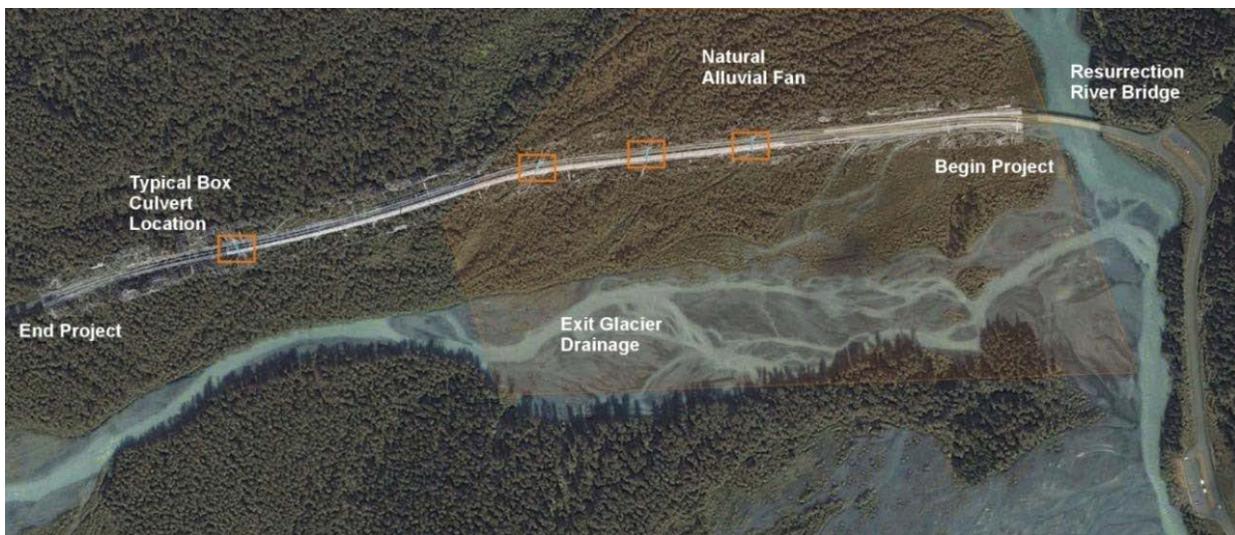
Aerial view of Alternative B: Road Raised Five Feet with Four Box Culverts
